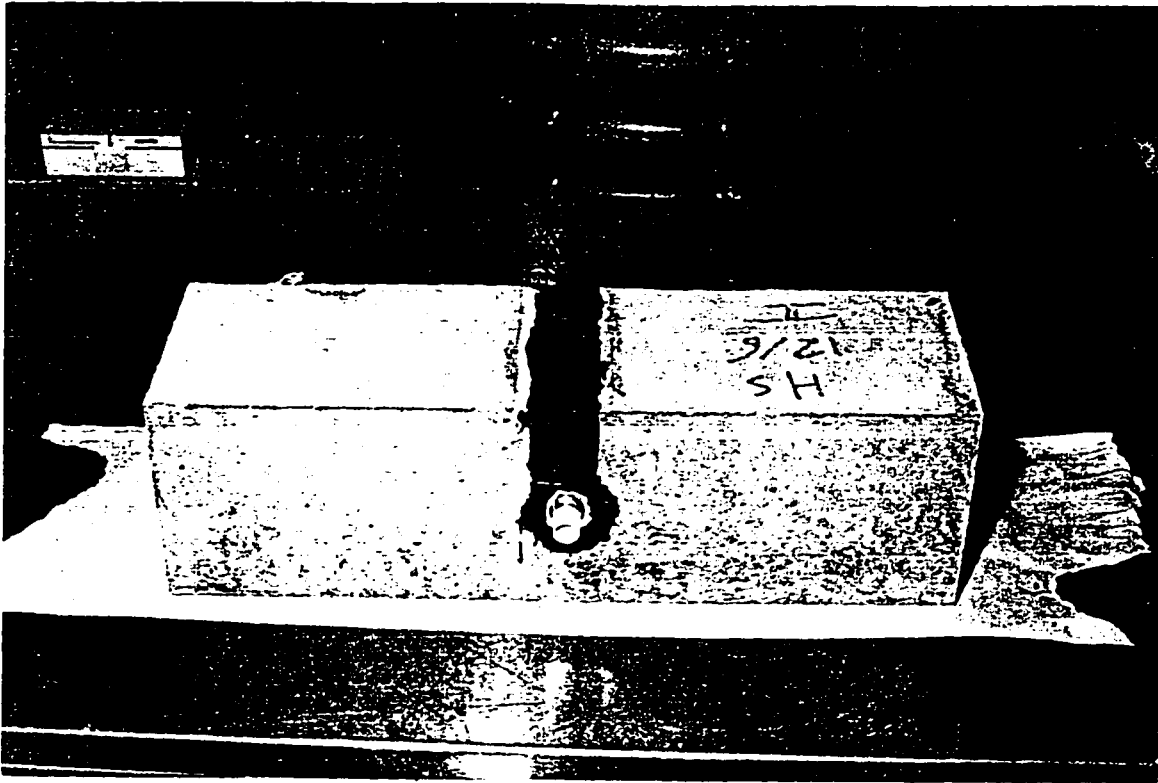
A beam specimen after repair, left for curing of the injected epoxy compound.
